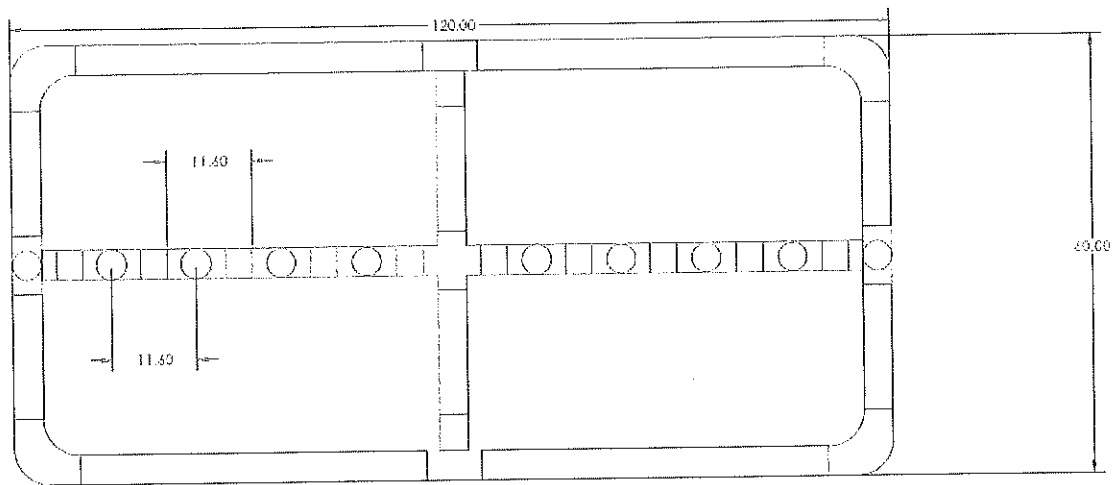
Top view of the prototype floating wetland breakwater frame, showing the top dimensions in inches.
